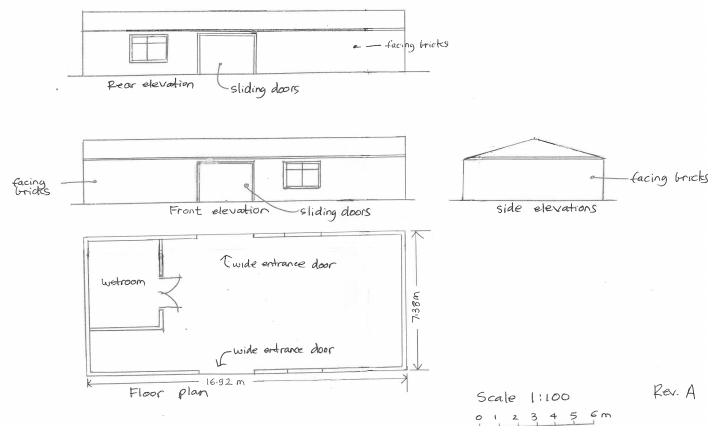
Proposed Plans and Elevations of application ref. 17/504435/FULL
